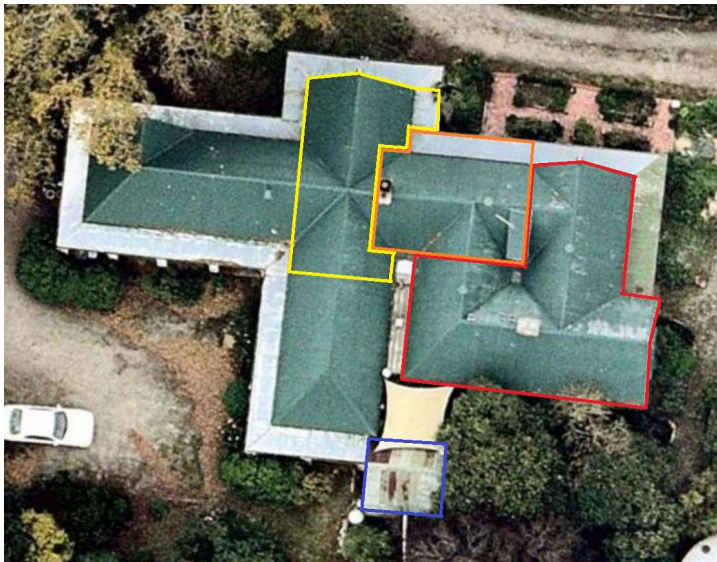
Roof plan with indication of the first three stages of construction: Red – the first stage of the house of c1850s-60s (possibly including a return verandah); Orange – second stage of two rooms, c1969-70s; Yellow – c1922 living room with the reconfiguration of the west end of the verandah; Blue – early 20th-century outbuilding. The rest of the house dates to 1993. (Adapted from Nearmap, 2020)
